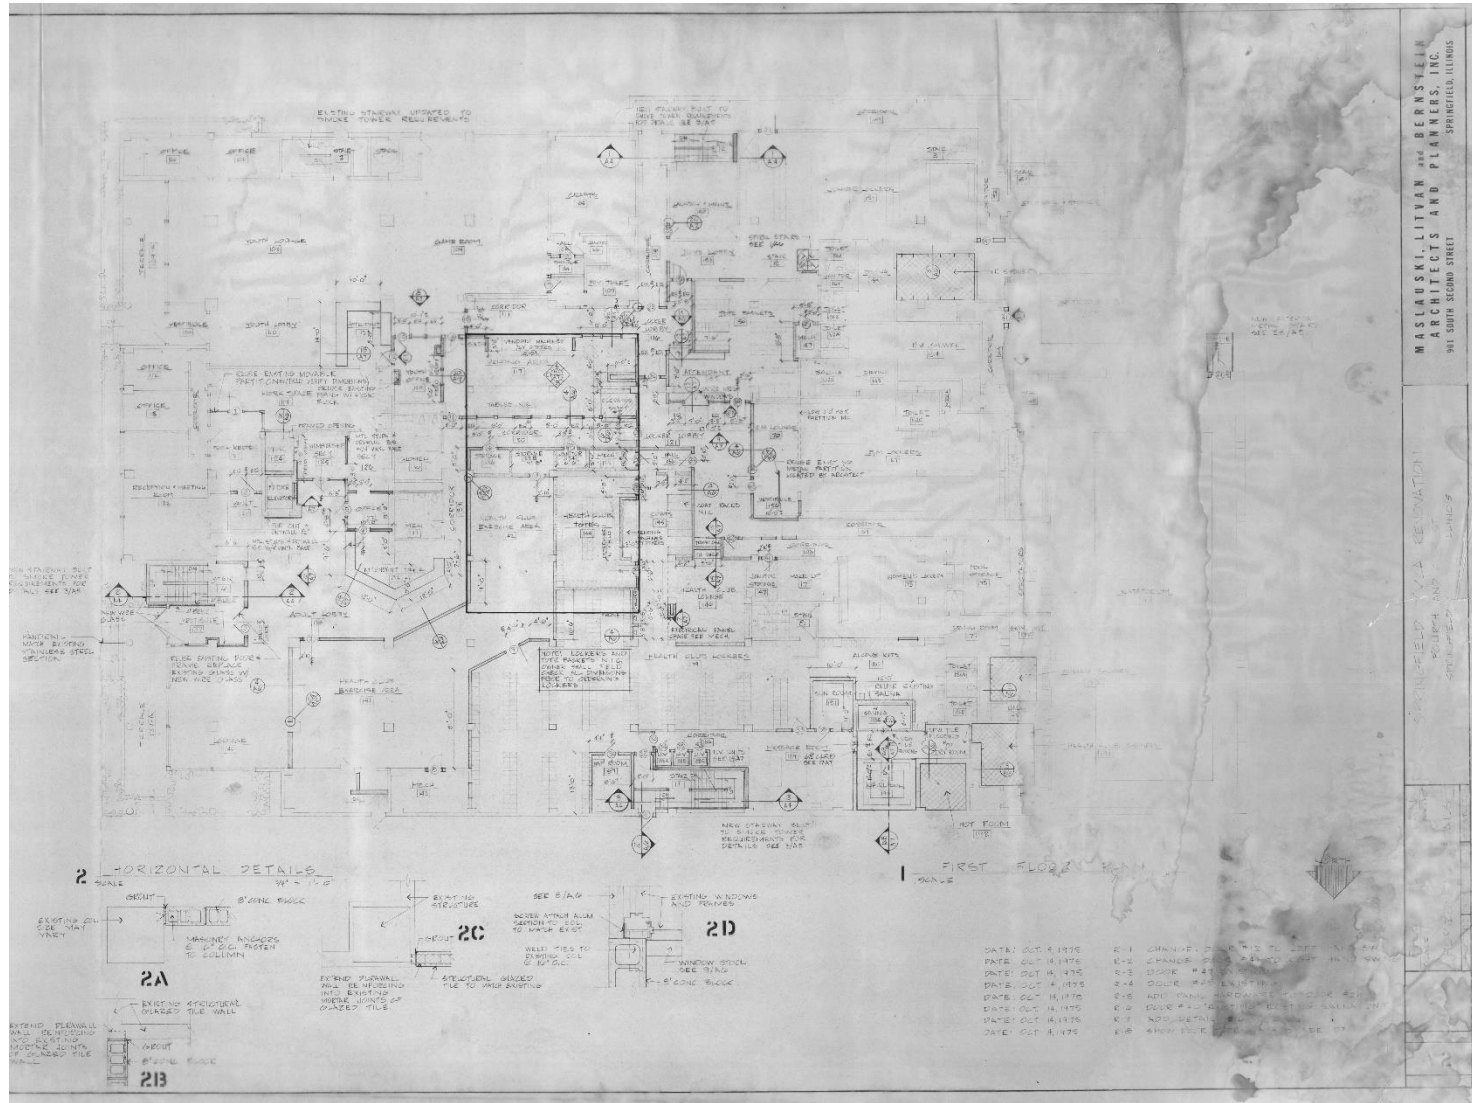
First Floor Plan, Springfield YMCA Renovation (Maslauski, Litvan and Bernstein 1975; Sheet No. A2). [December 8, 1975].
